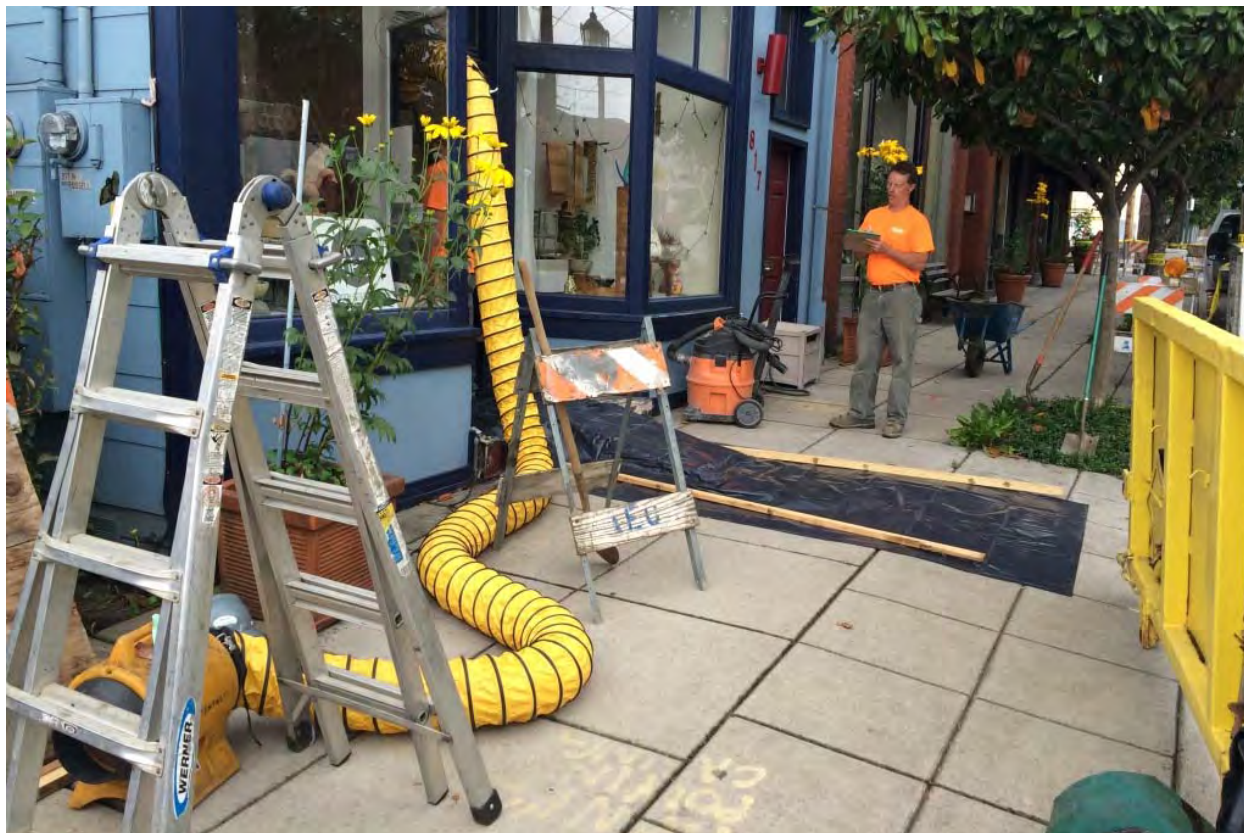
Area above the proposed source area excavation. Photograph taken facing south.
